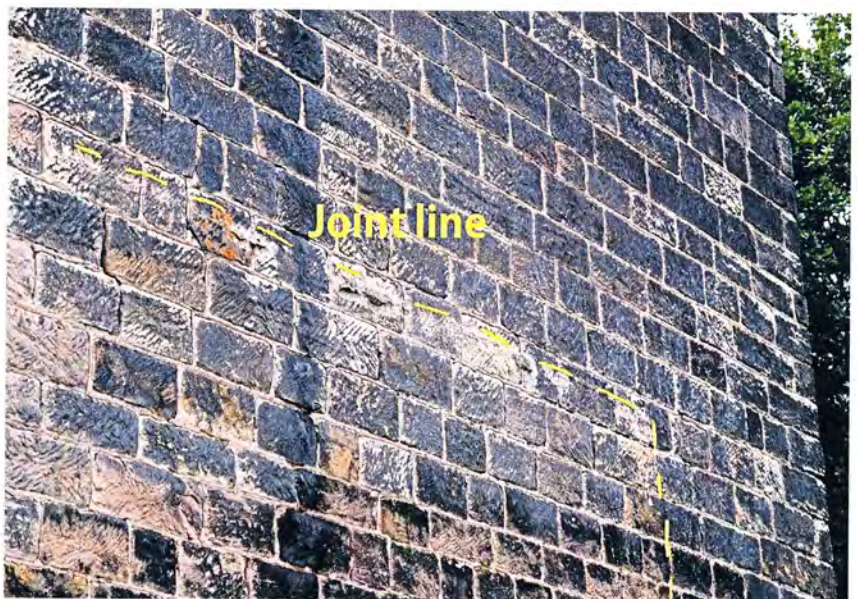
Witness mark on the east wall suggesting previous presence of a roof structure.
